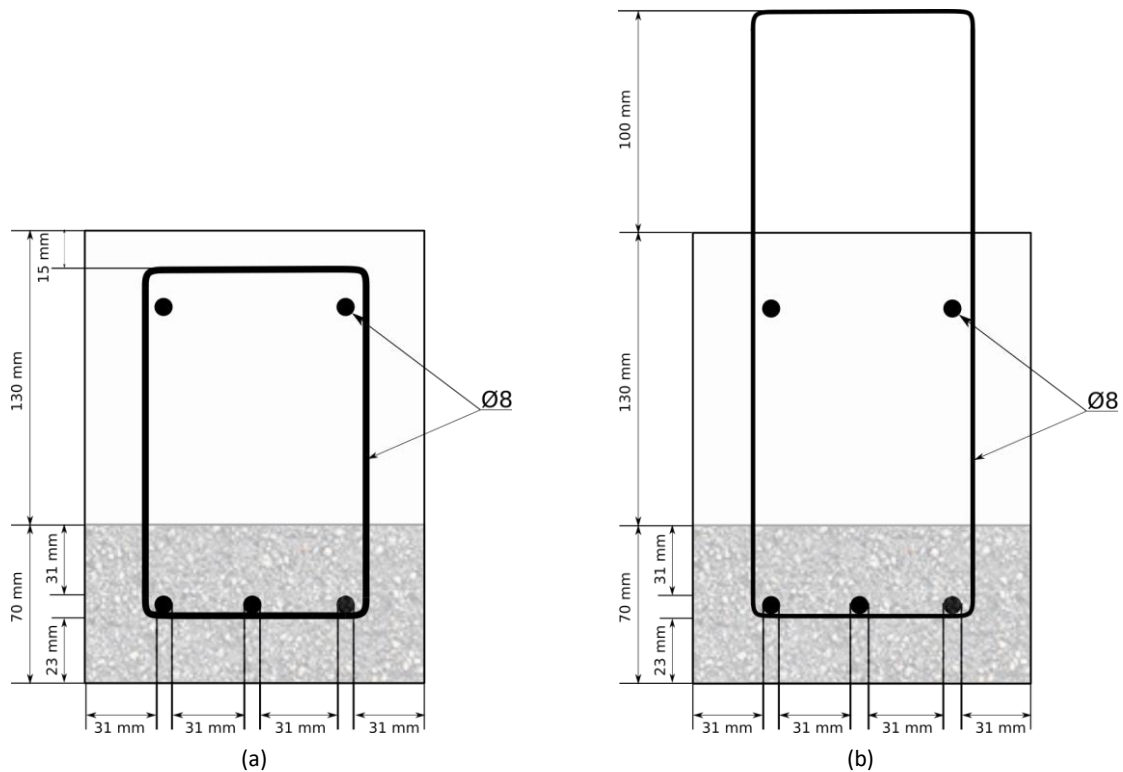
(a) Cross-section A-A; (b) Cross-section B-B
